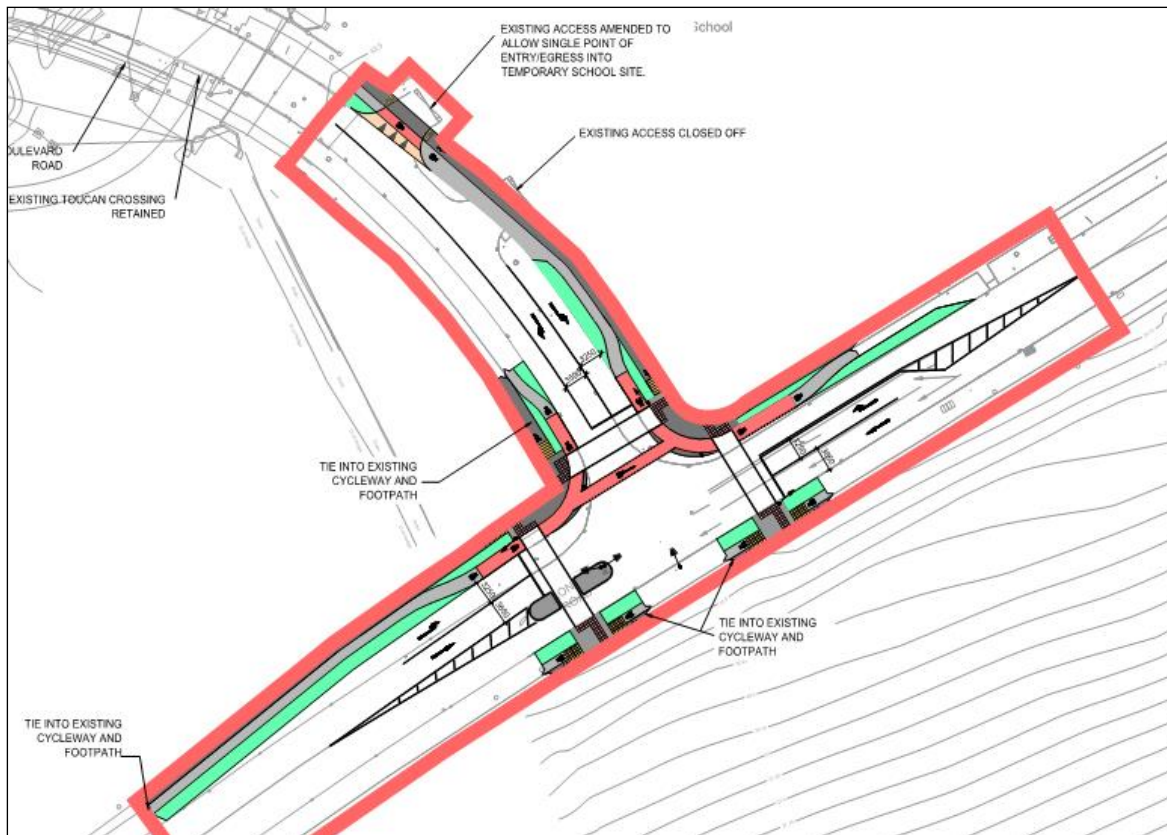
Proposed Boulevard Road and Clonard Road Signal Improvements With Cycle Protected Infrastructure
